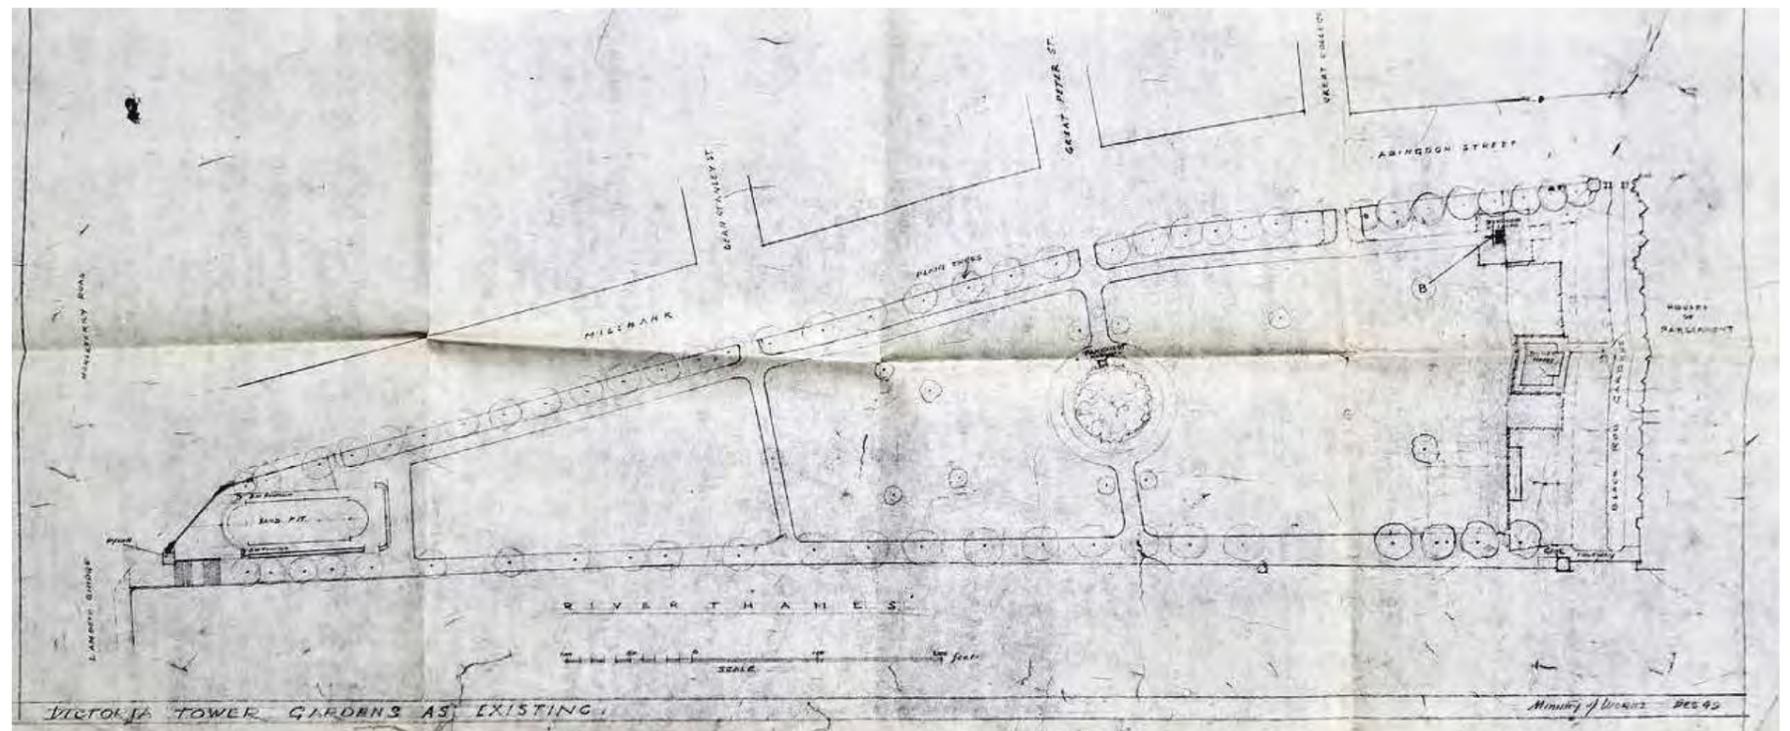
As-existing layout of the garden in 1949, almost certainly showing its pre-war arrangement
